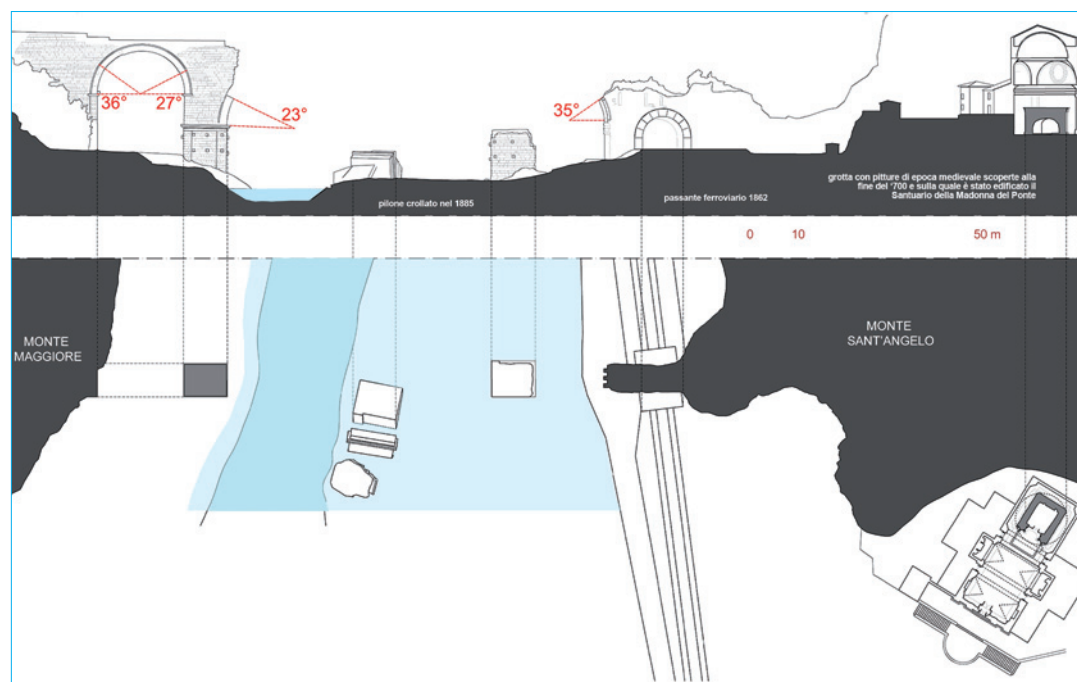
Graphic restitution of the survey. Floor plan and elevation (by Maiezza, Rossi)
